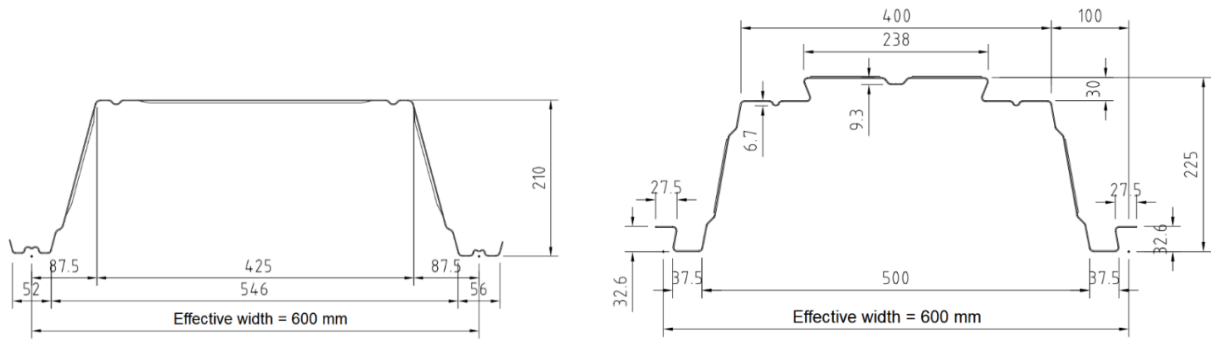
Steel profile for deep decks: ComFlor 210 (left) and ComFlor 225 (right)[4]
